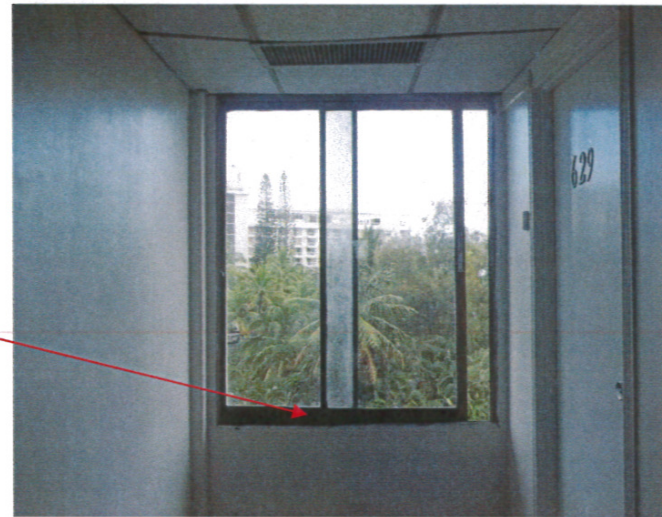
Floors, 1-6 and Halau Room Drywall Walls
